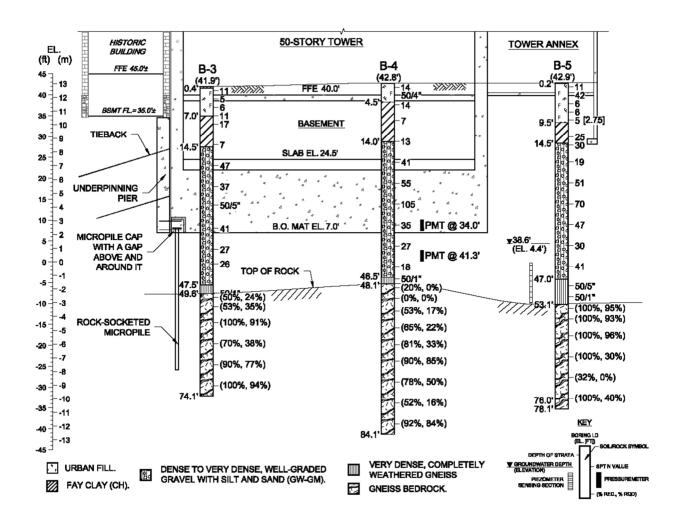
Geotechnical section—west to east (GeoStructures, Inc., 2018).
